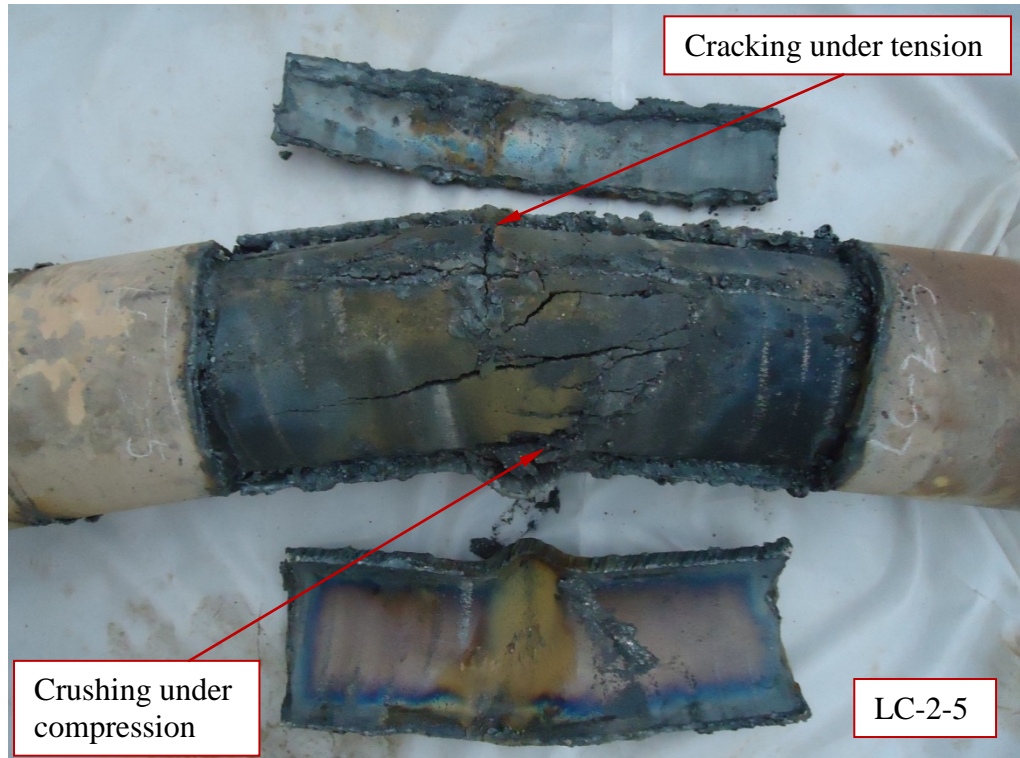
Transversal cracking of concrete by flexural buckling failure
